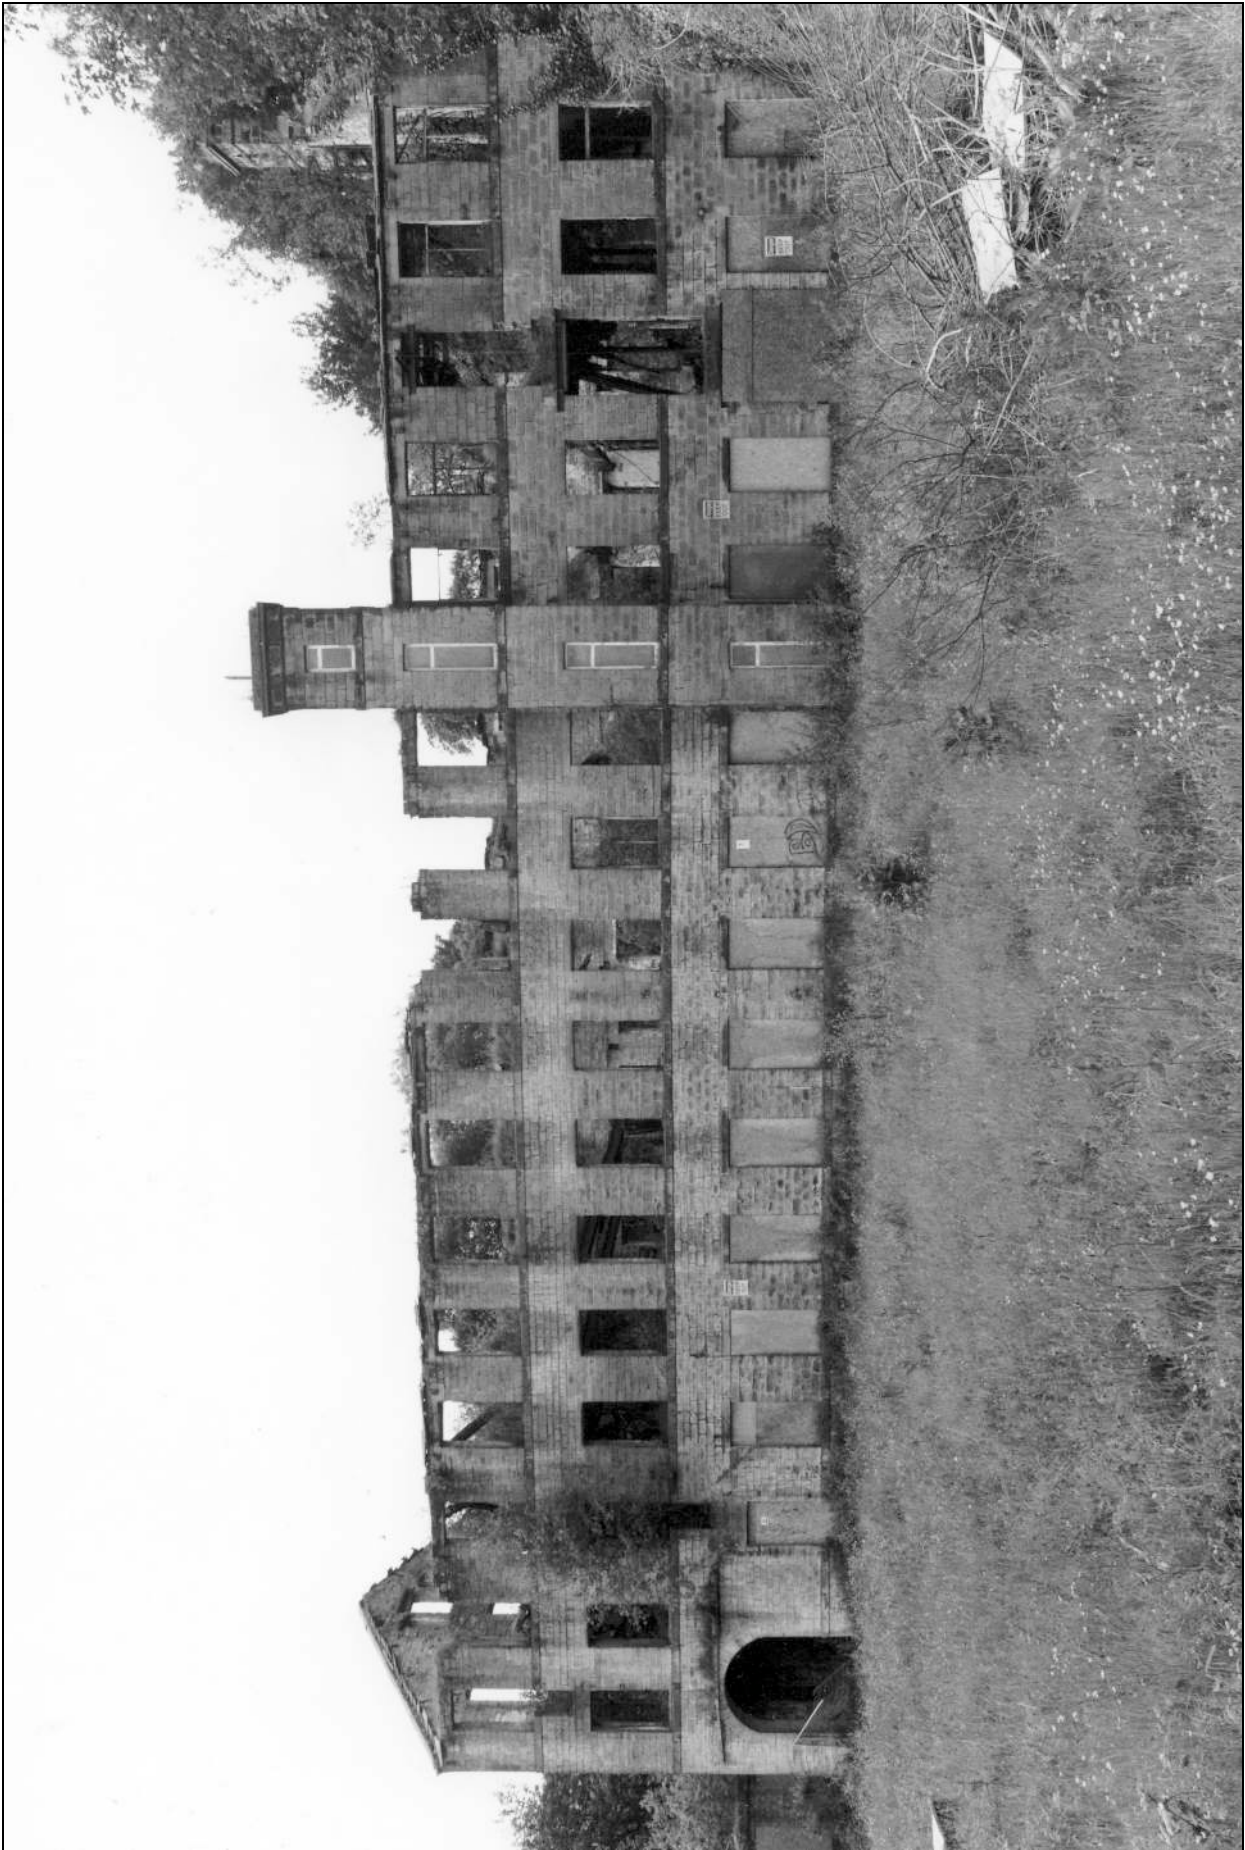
Spinning mill: north elevation (film 1, frame 1)
